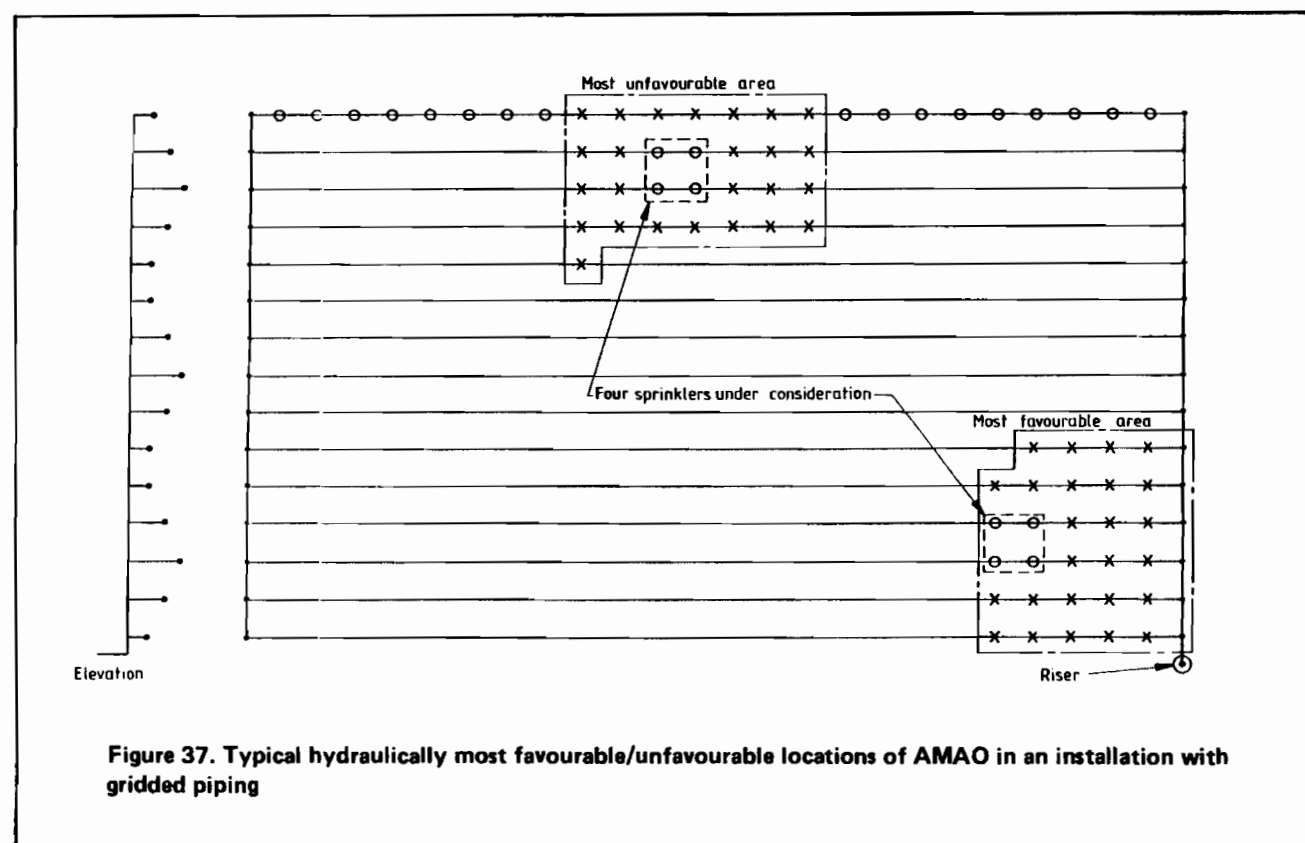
Typical hydraulically most favourable/unfavourable locations of AMAO in an installation with gridded piping
